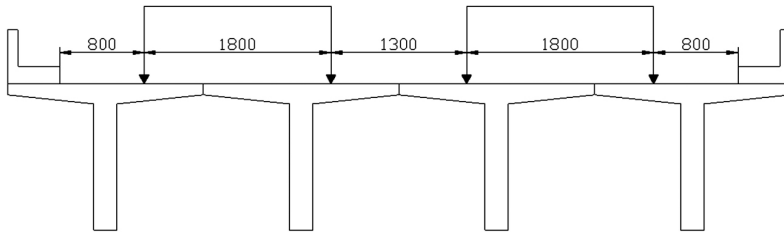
Diagram of transverse centered load vehicle arrangement (unit: mm)
